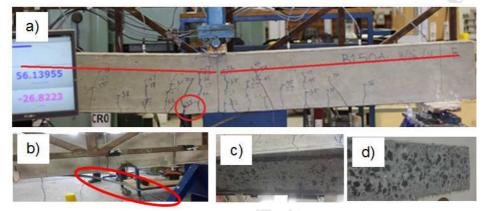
(a) Failure mode of specimen B150A (b) Debonded BFRP strip; (c) Concrete surface after debonding; (d) BFRP/concrete interface after debonding
